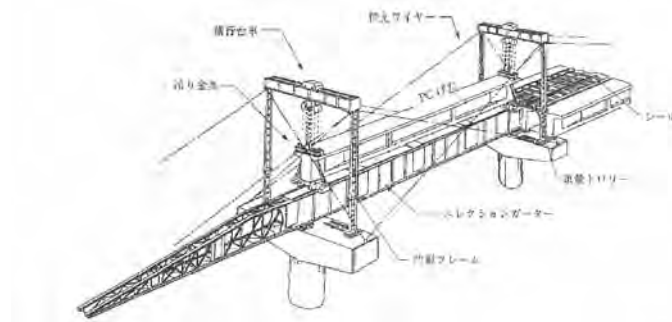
Reference Sketch of The Erection Girder Method
